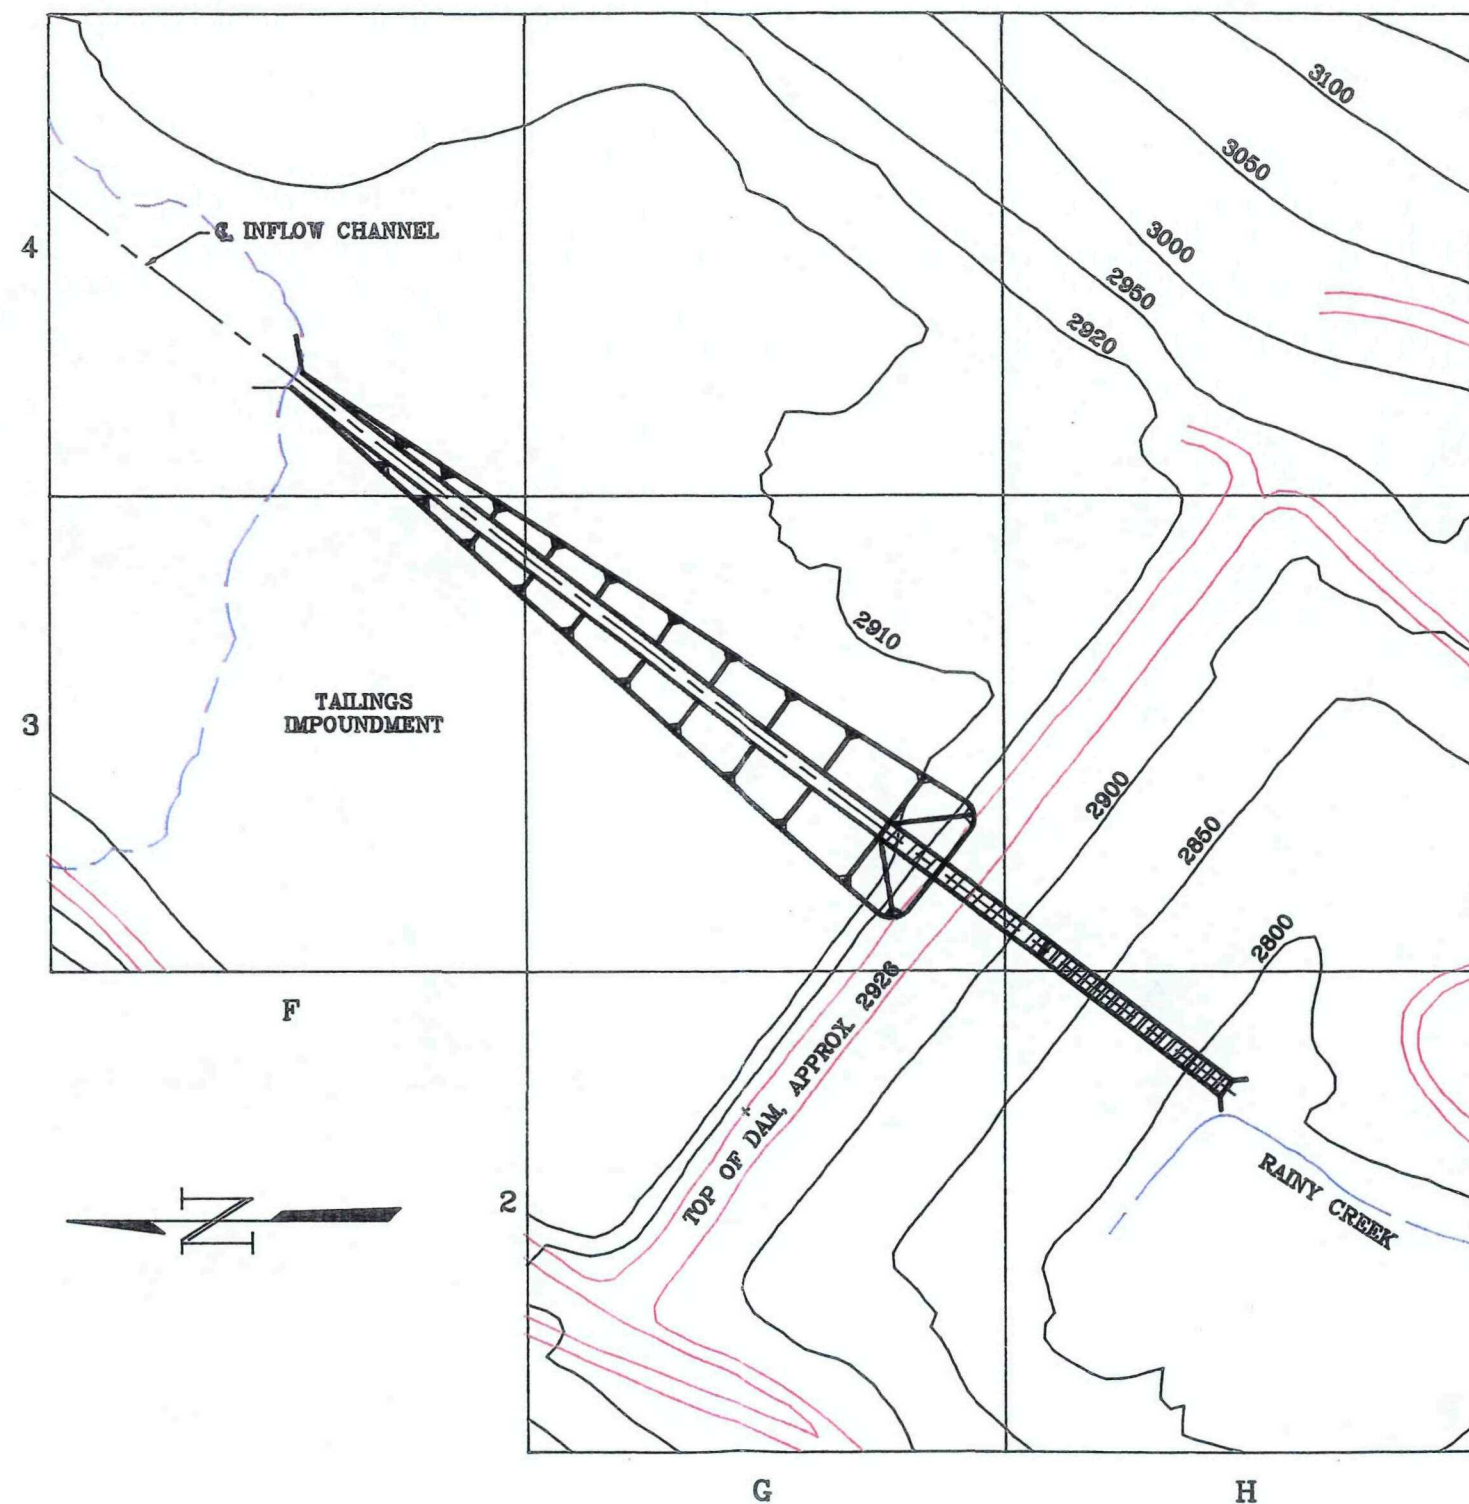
Plan view of outlet/control structure over dam face for routing floods through the tailings impoundment (Alternate IIe).
